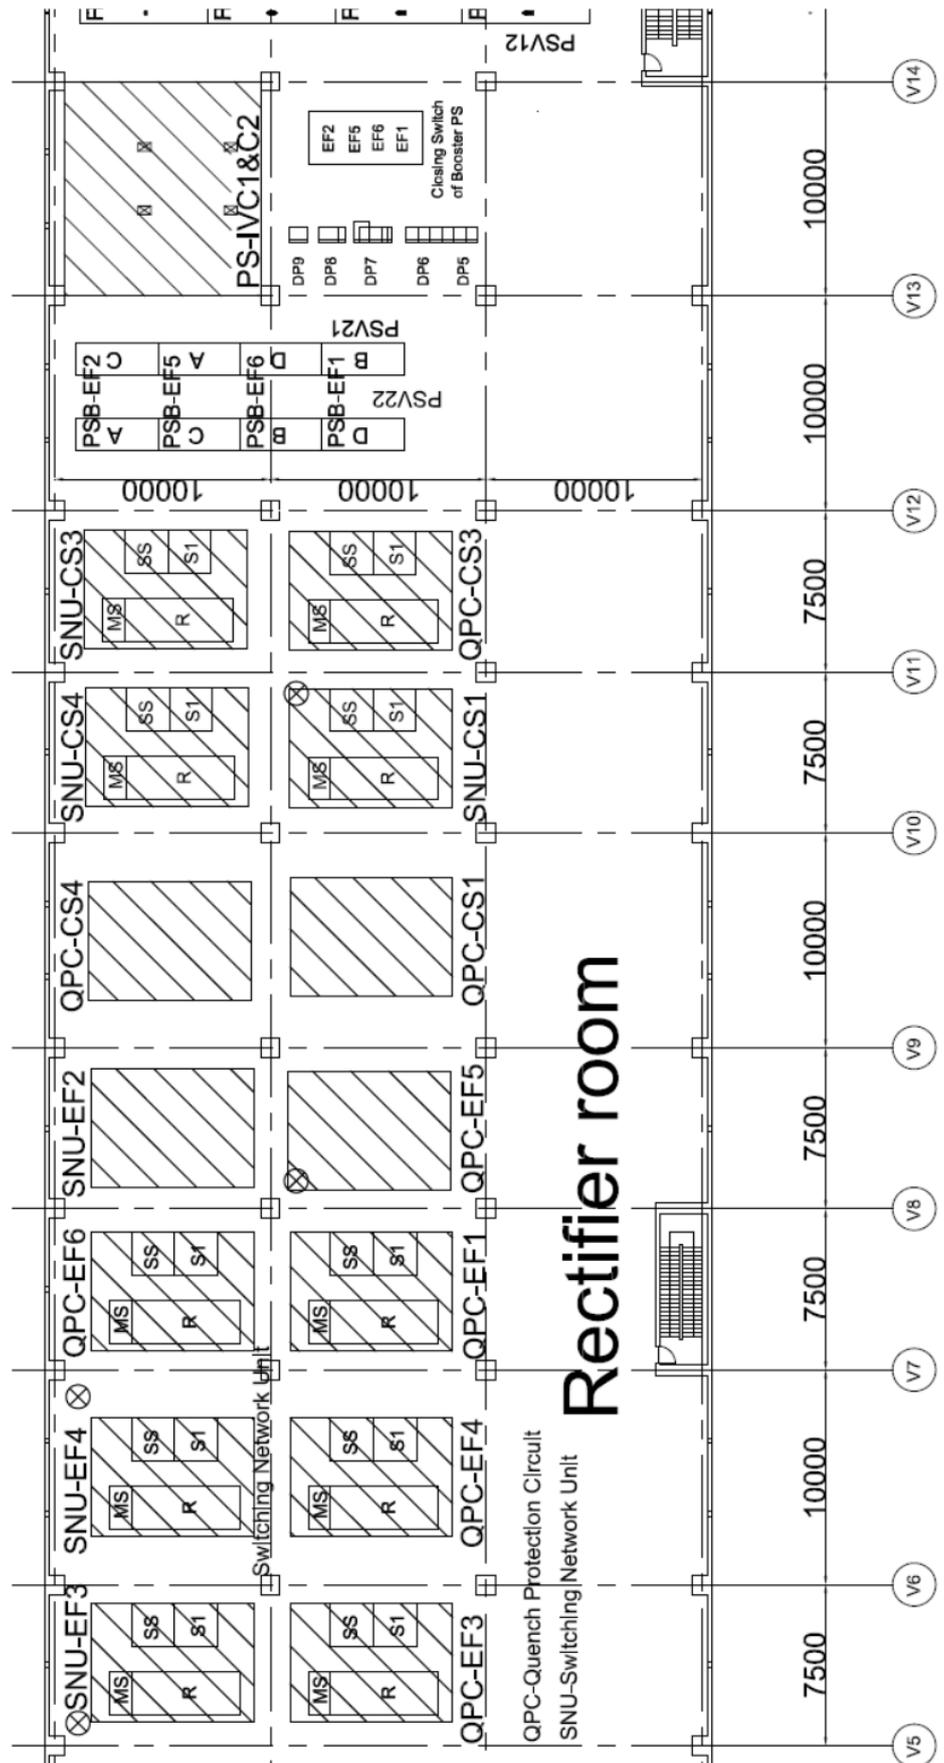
Layout of the devices in the SNU area (zoom of the second floor of the Rectifier Building).
